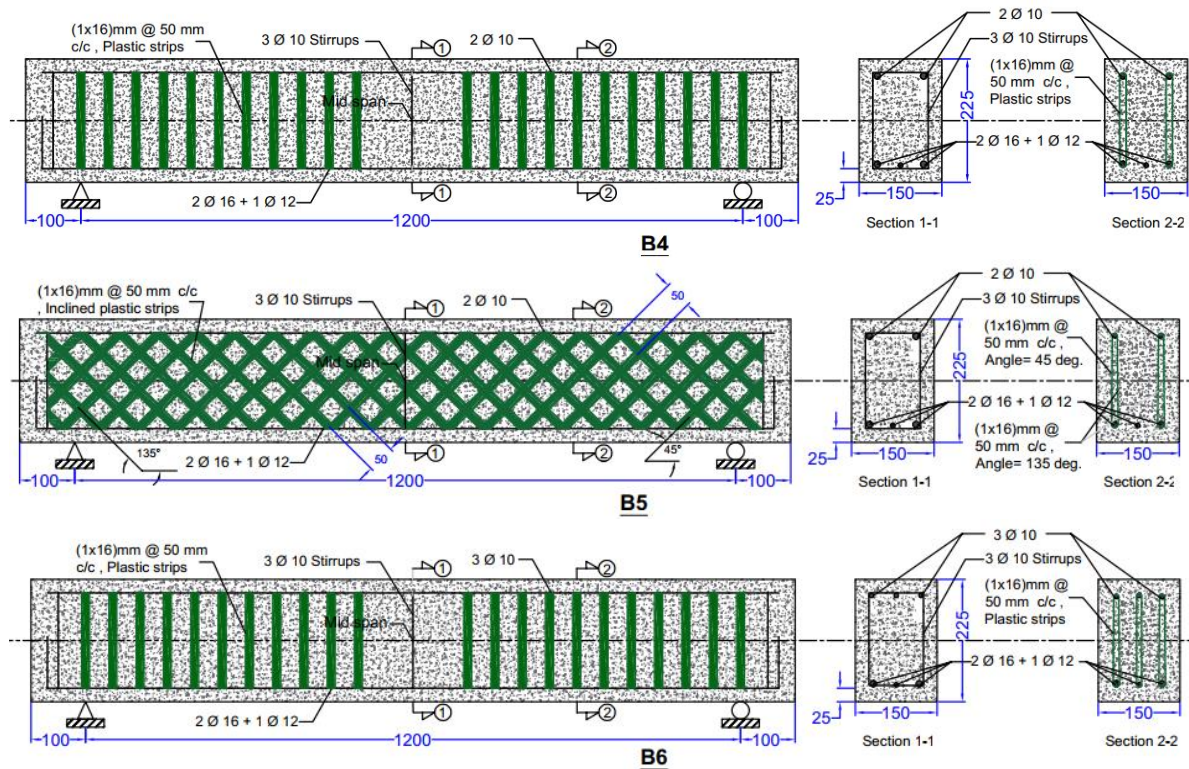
Details of configuration waste plastic strips stabilize as stirrups in the test beams
